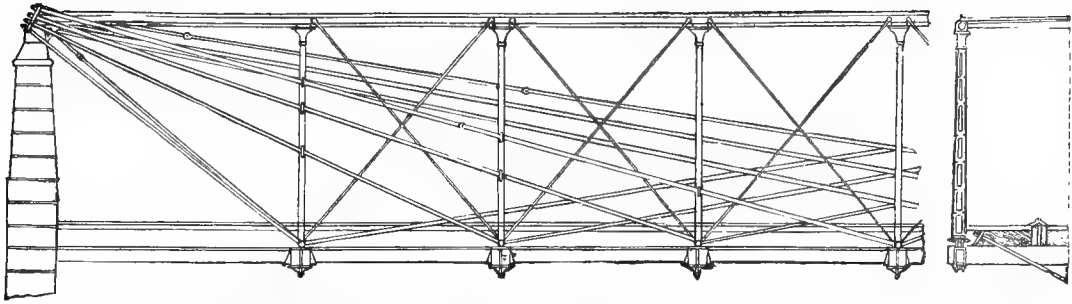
Half Elevation and Section of Bollman Truss, Baltimore and Ohio R. R.
